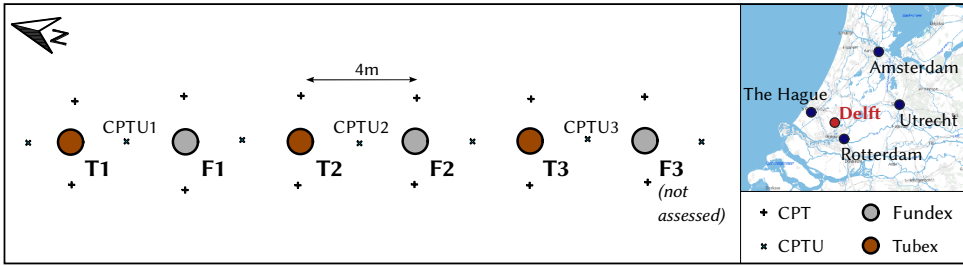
Layout of the Delft test site at Flood Proof Holland (inset map courtesy of www.pdok.nl).
